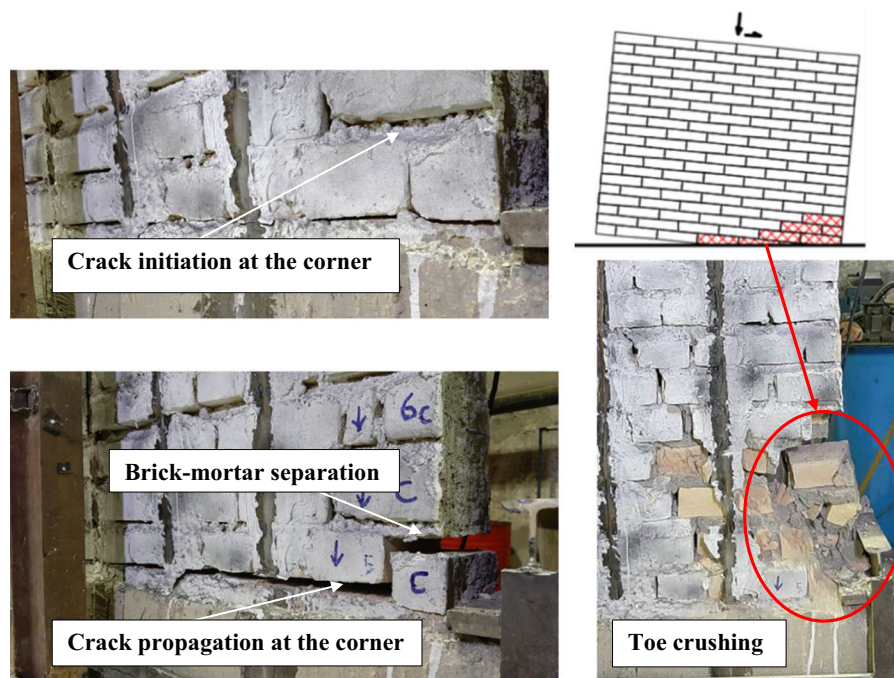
Failure mode observed in non-prestressed NSM strengthened wall
